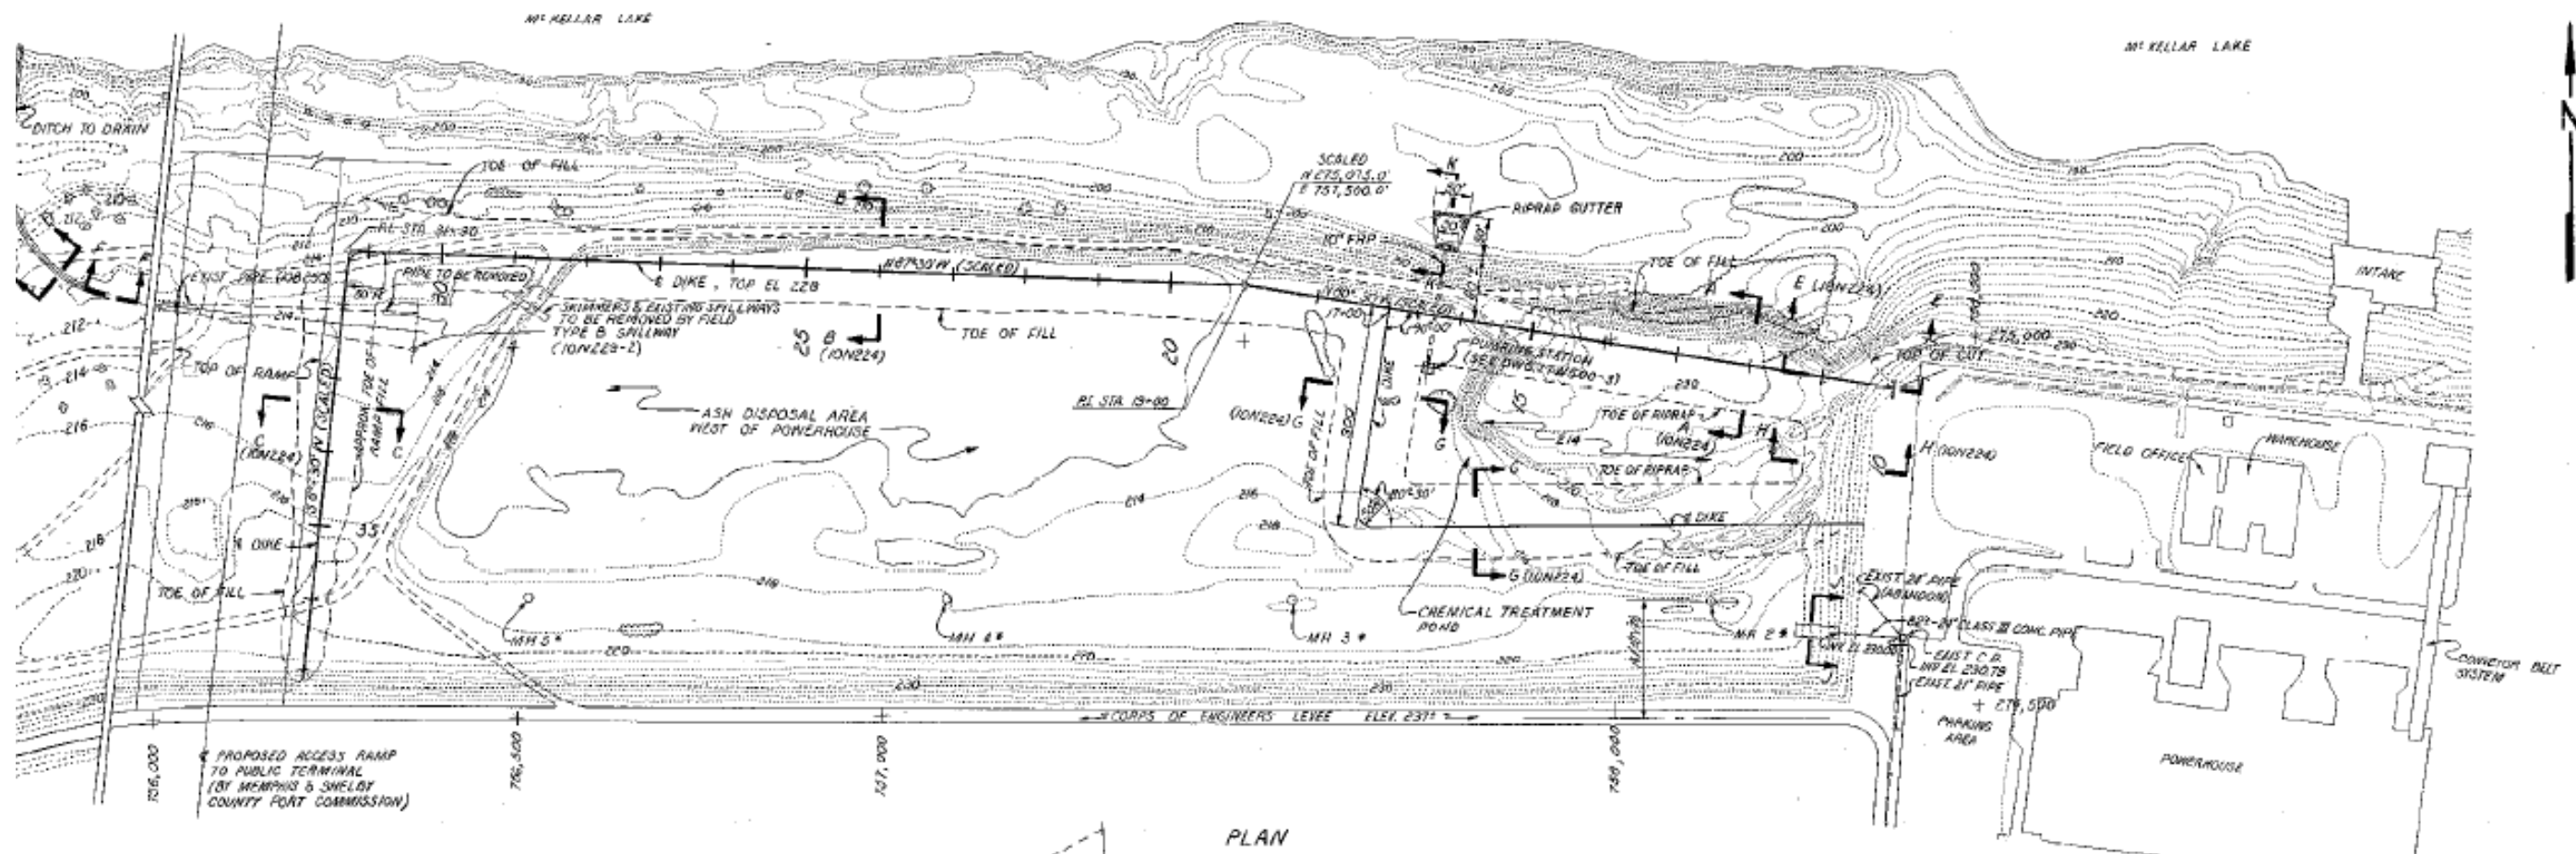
West Ash Pond Design Layout (TVA Drawing 10N223, R.2)
